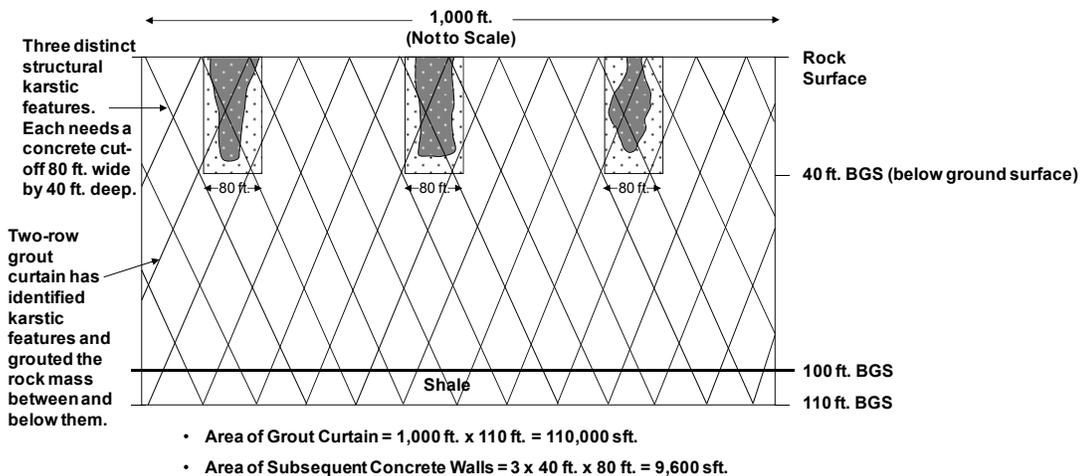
Discrete karstic features have been found during the drilling and grouting, driven by major structural lineations. Thus, individual concrete cutoff panels can be installed, after drilling and grouting have confirmed the extent of these features and have pretreated them to permit safe concrete cutoff construction.
